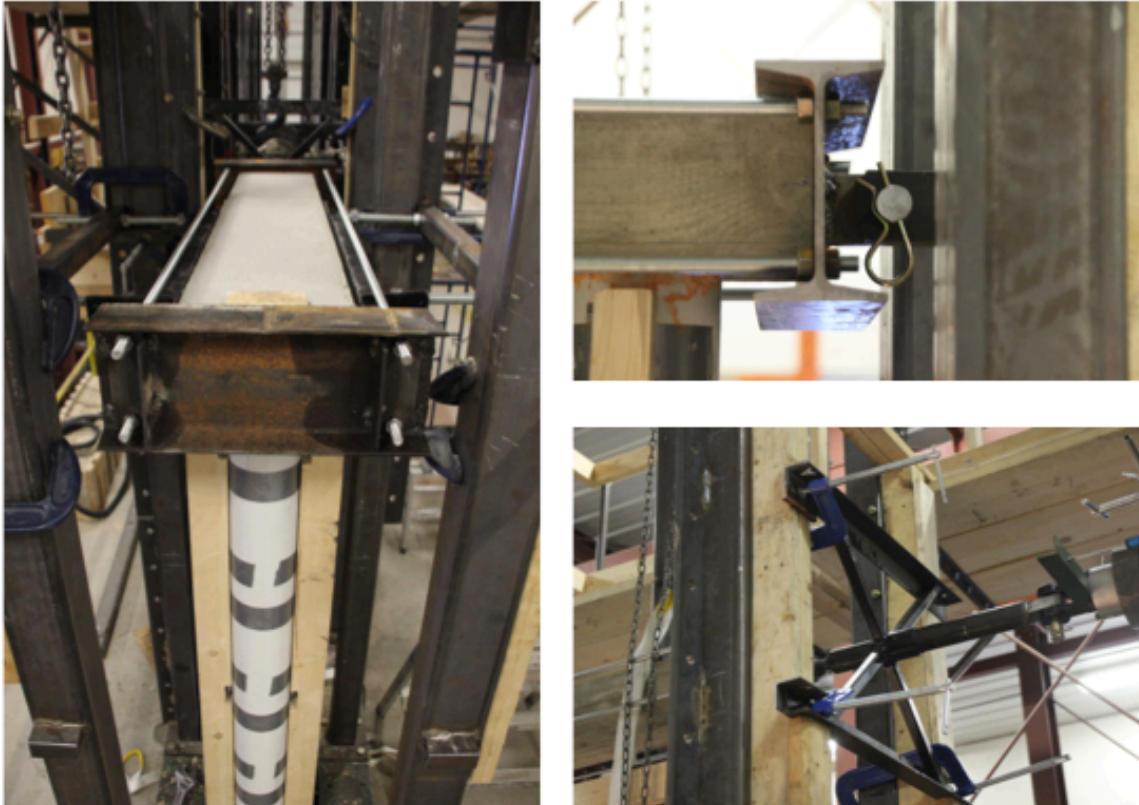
Cyclic Loading I-Beam Connection to Bond Beam
